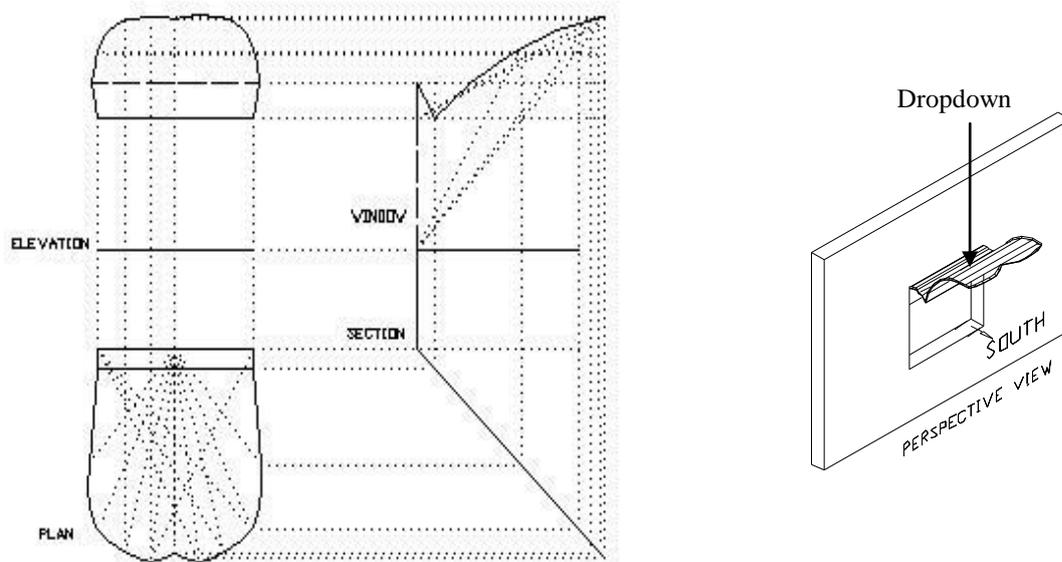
Plan, Section, Elevation and Perspective View of Proposed Static Sunshade
